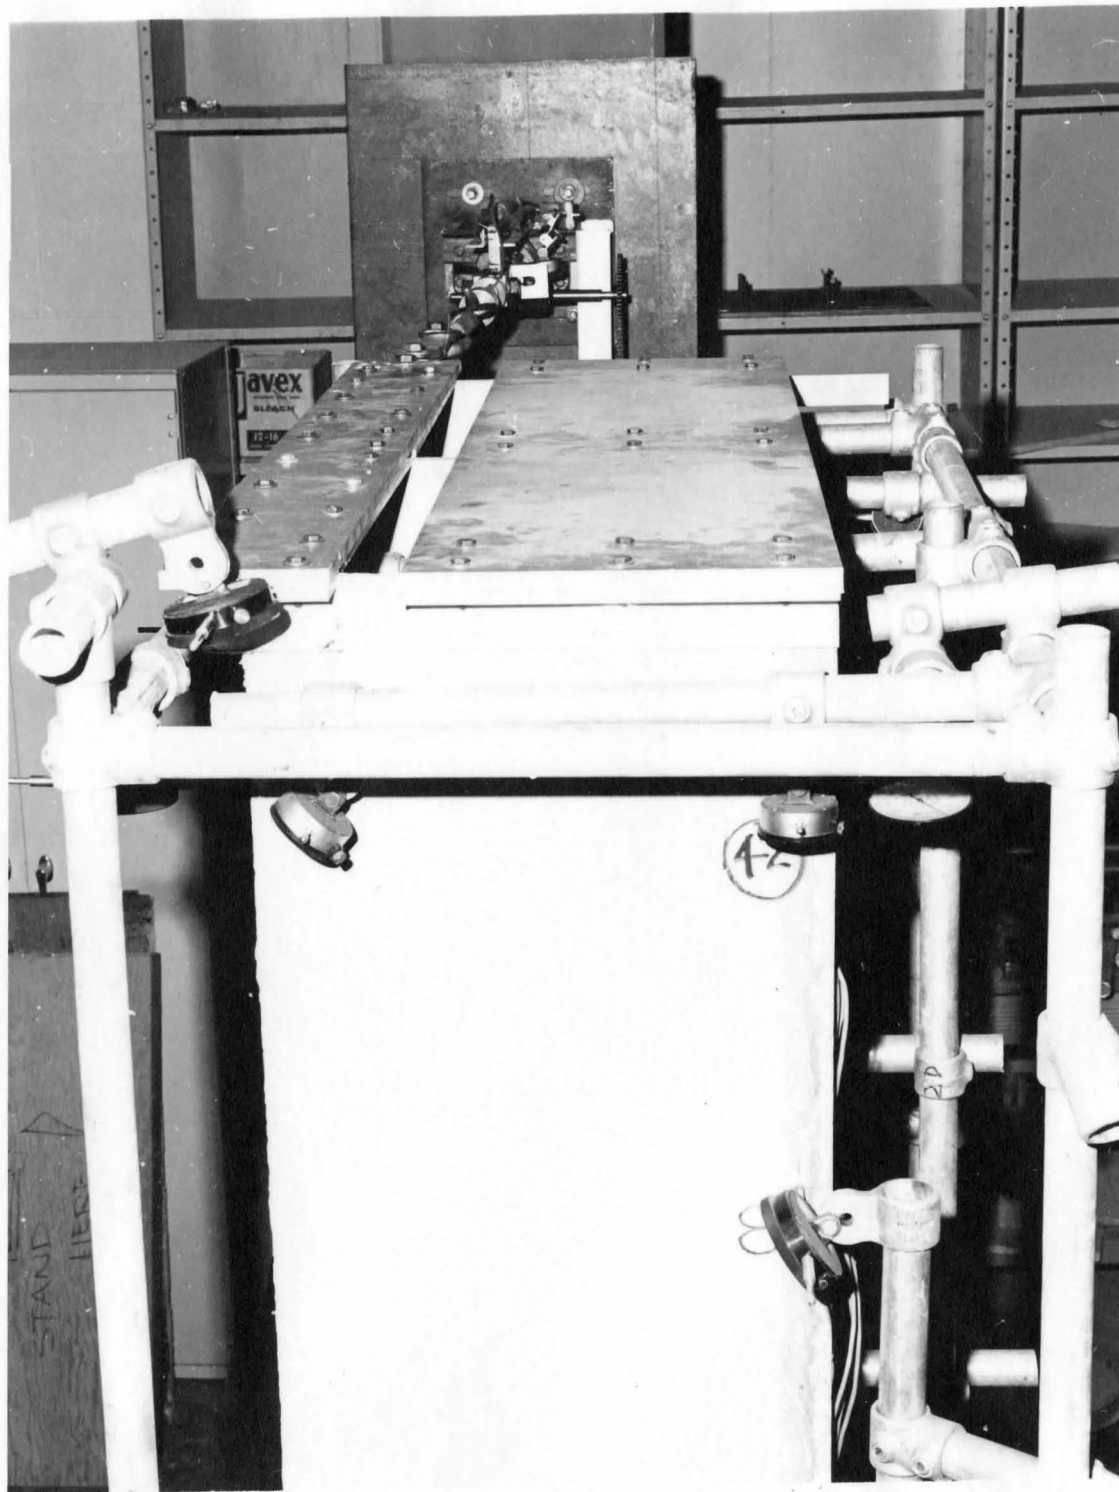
ALUMINUM CAPPING SYSTEM IN POSITION ON BUILDING 11
